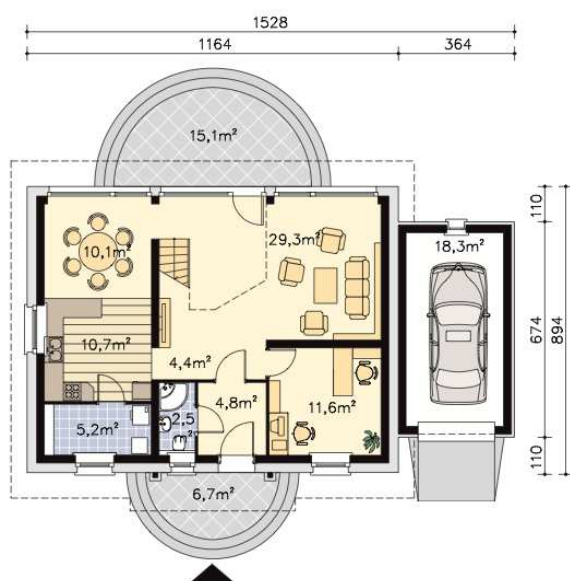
Ground floor plan of the passive house in Smolec. [15]
